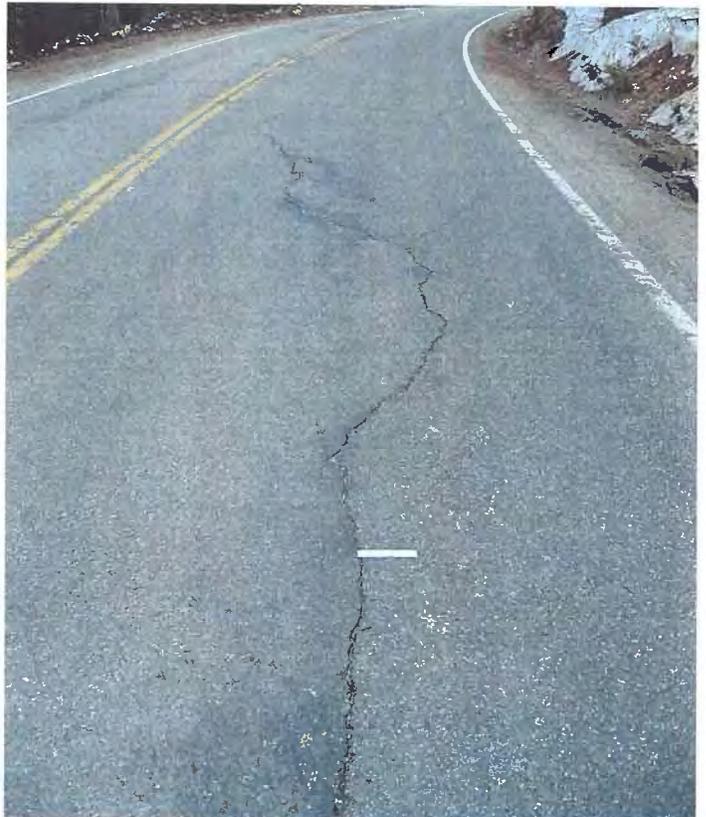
MP 0.10-0.20 - Typical raveling of roadway
